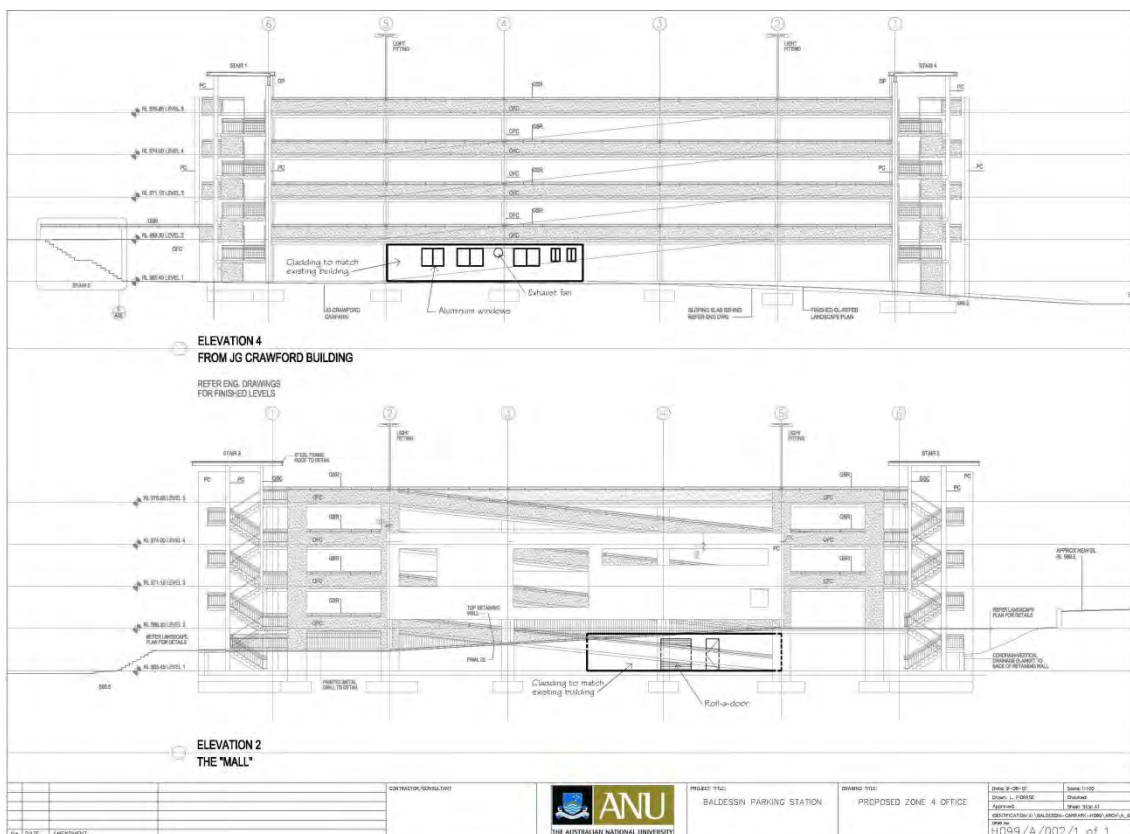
Architectural plans for the Baldessin Parking Station Building, August 2001.
